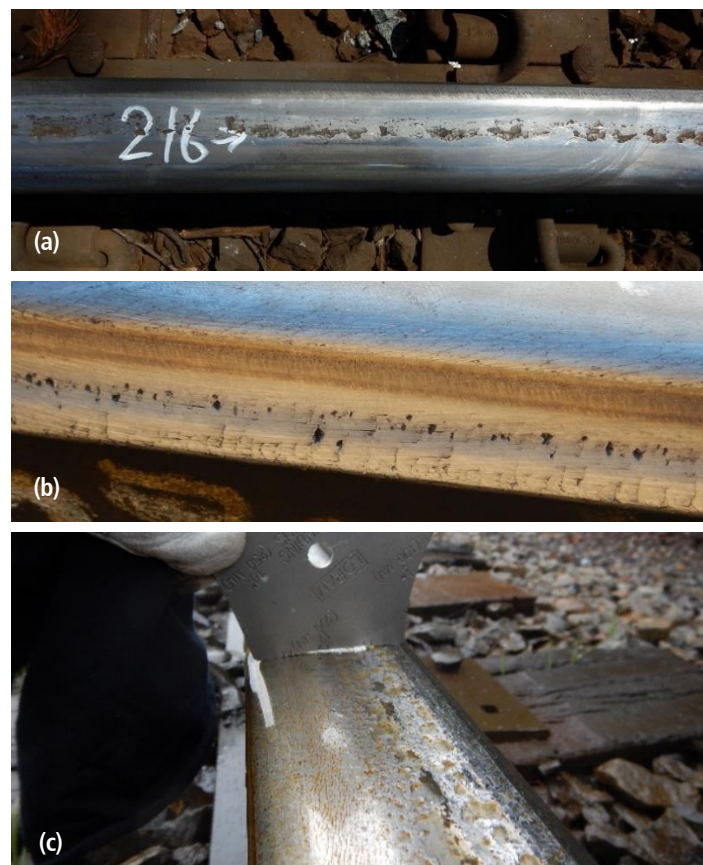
(a) Top of rail RCF in IS high rail, (b) gage face pitting and gage corner cracks in HS high rail in MP 348.9, and (c) RCF on HS low rail close to field corner in MP 349.3
